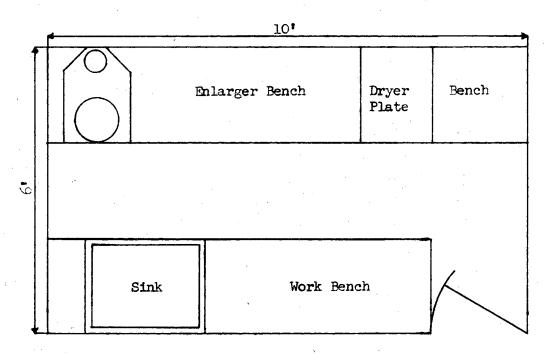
DARKROOM FLOOR PLAN - PERRY DAILY JOURNAL. (SCALE 1/2" = 1")
